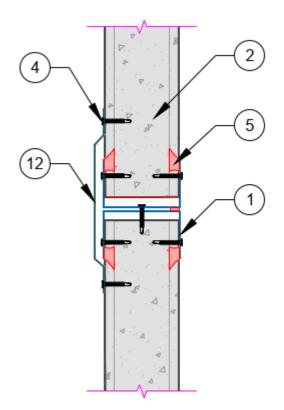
Back-to-back C-track connection in dual stack wall with metal flashing on unexposed side
